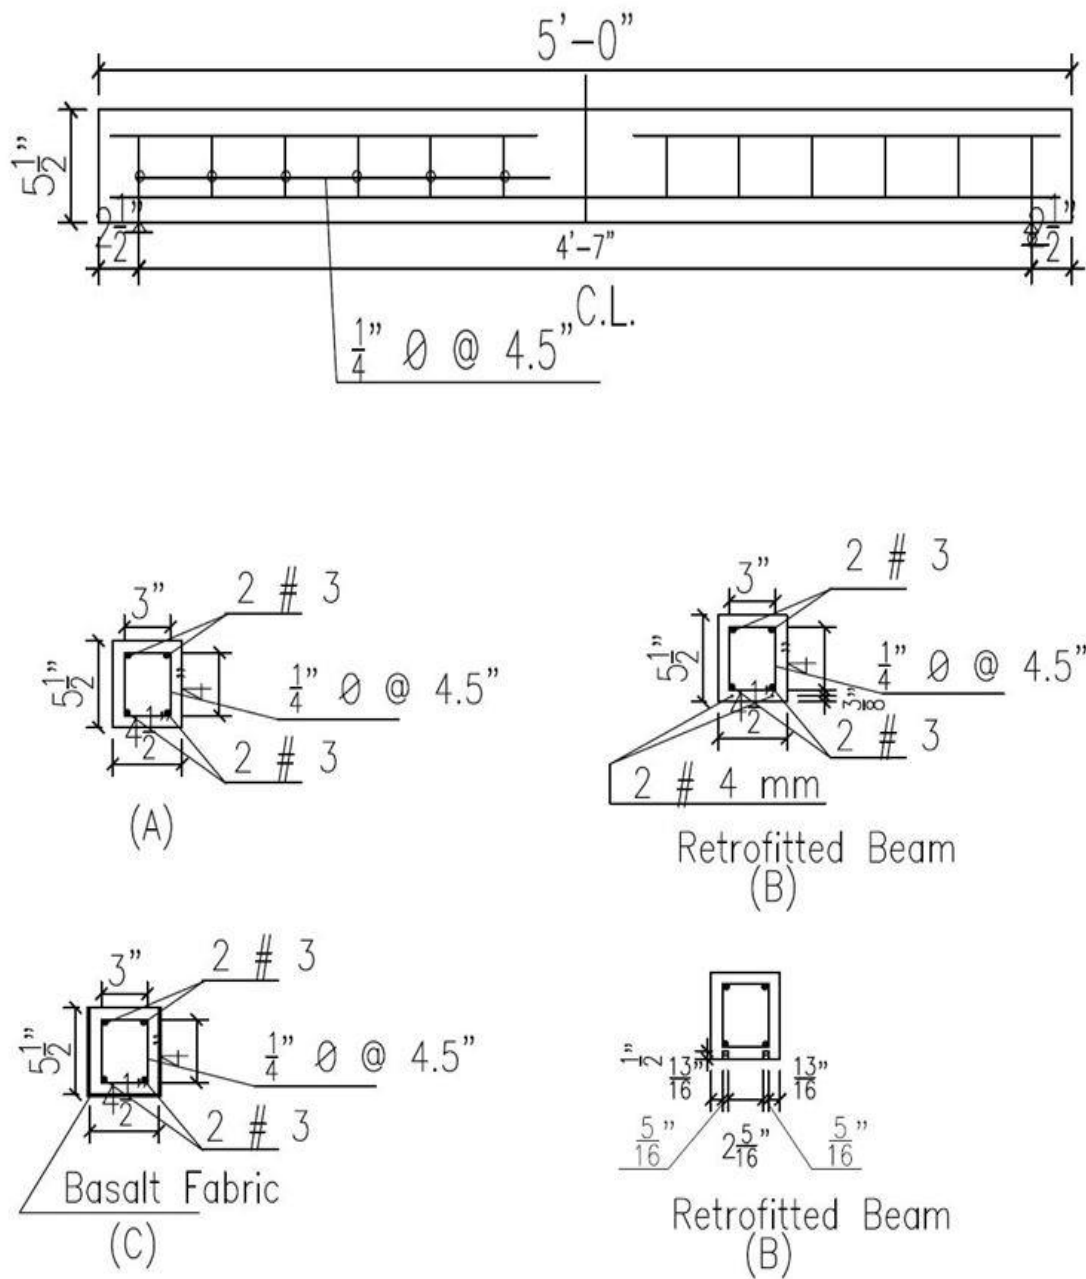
Typical Cross Section for the Simply Supported Beam with Steel Tension Only
